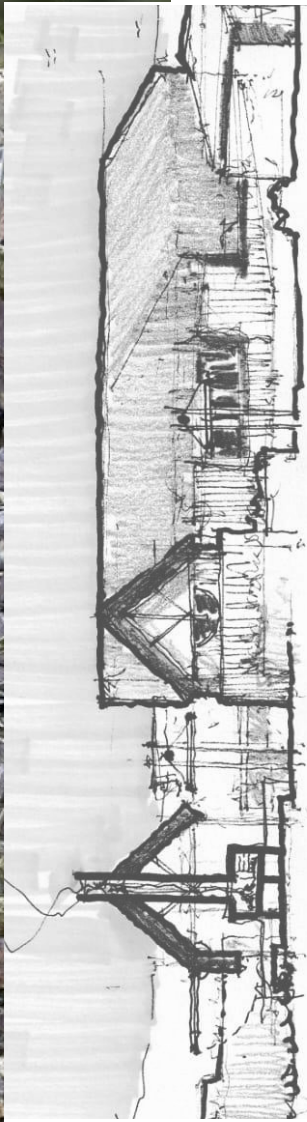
West elevation of the rock wall perched on the hillside (E. Summer, 2019).
